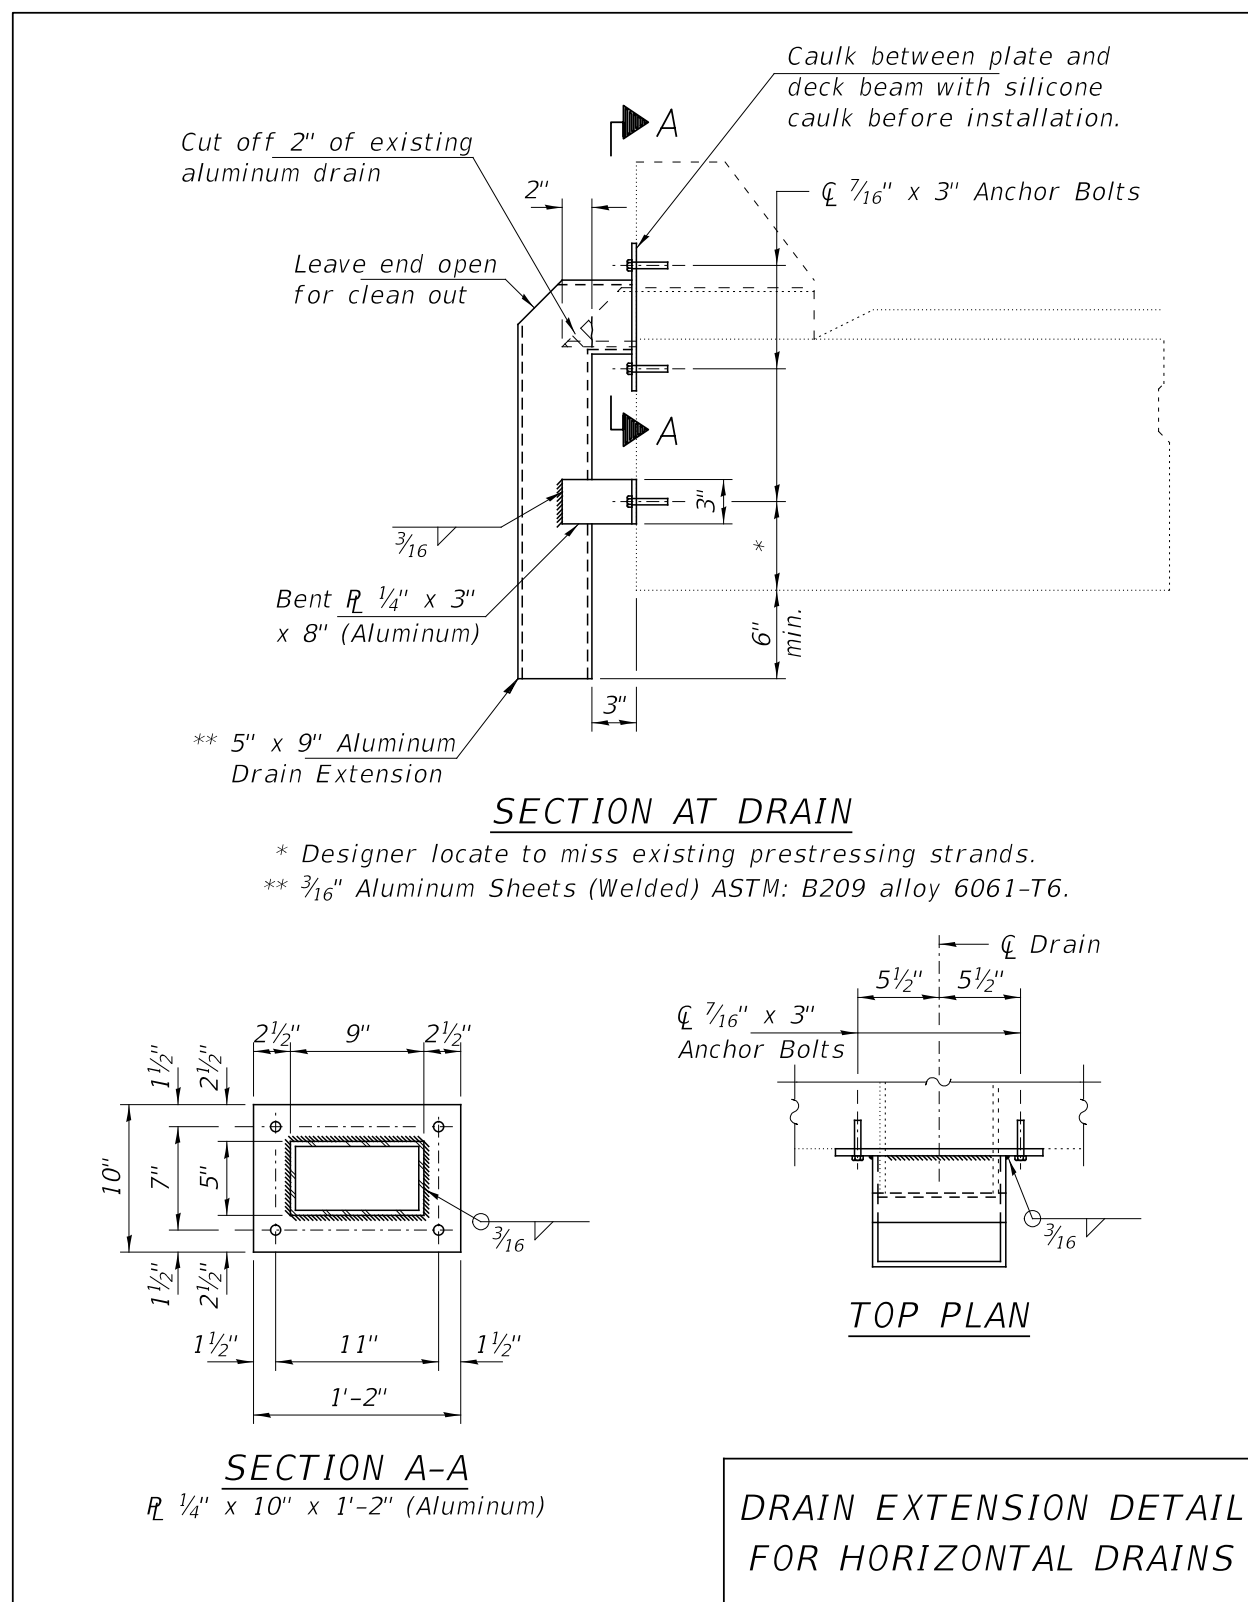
Drain Extension Detail for Horizontal Drains
